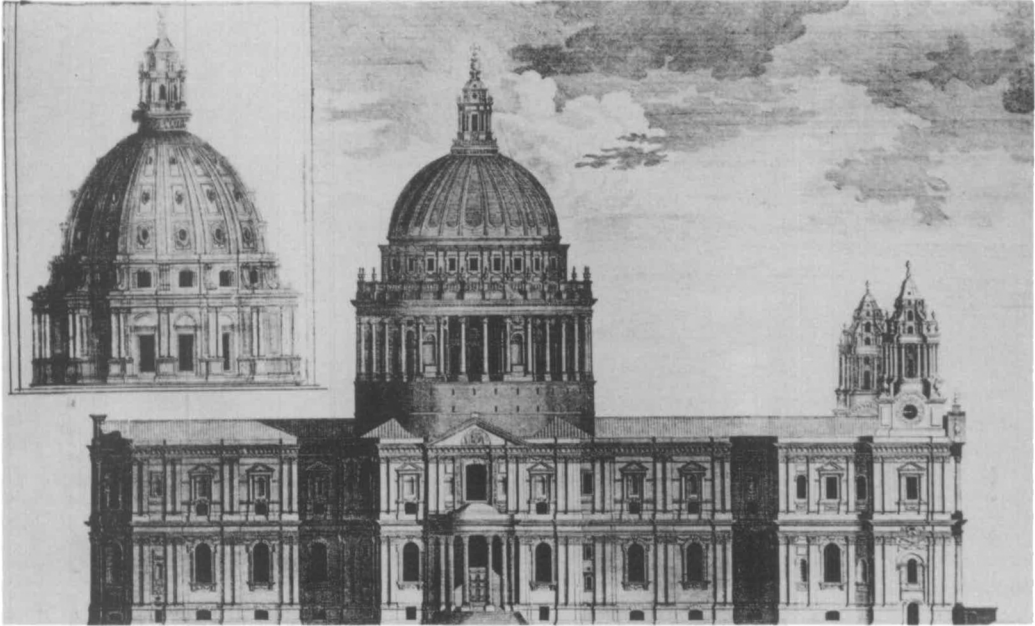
St Paul's. Engraved north elevation with addition (SP106)
